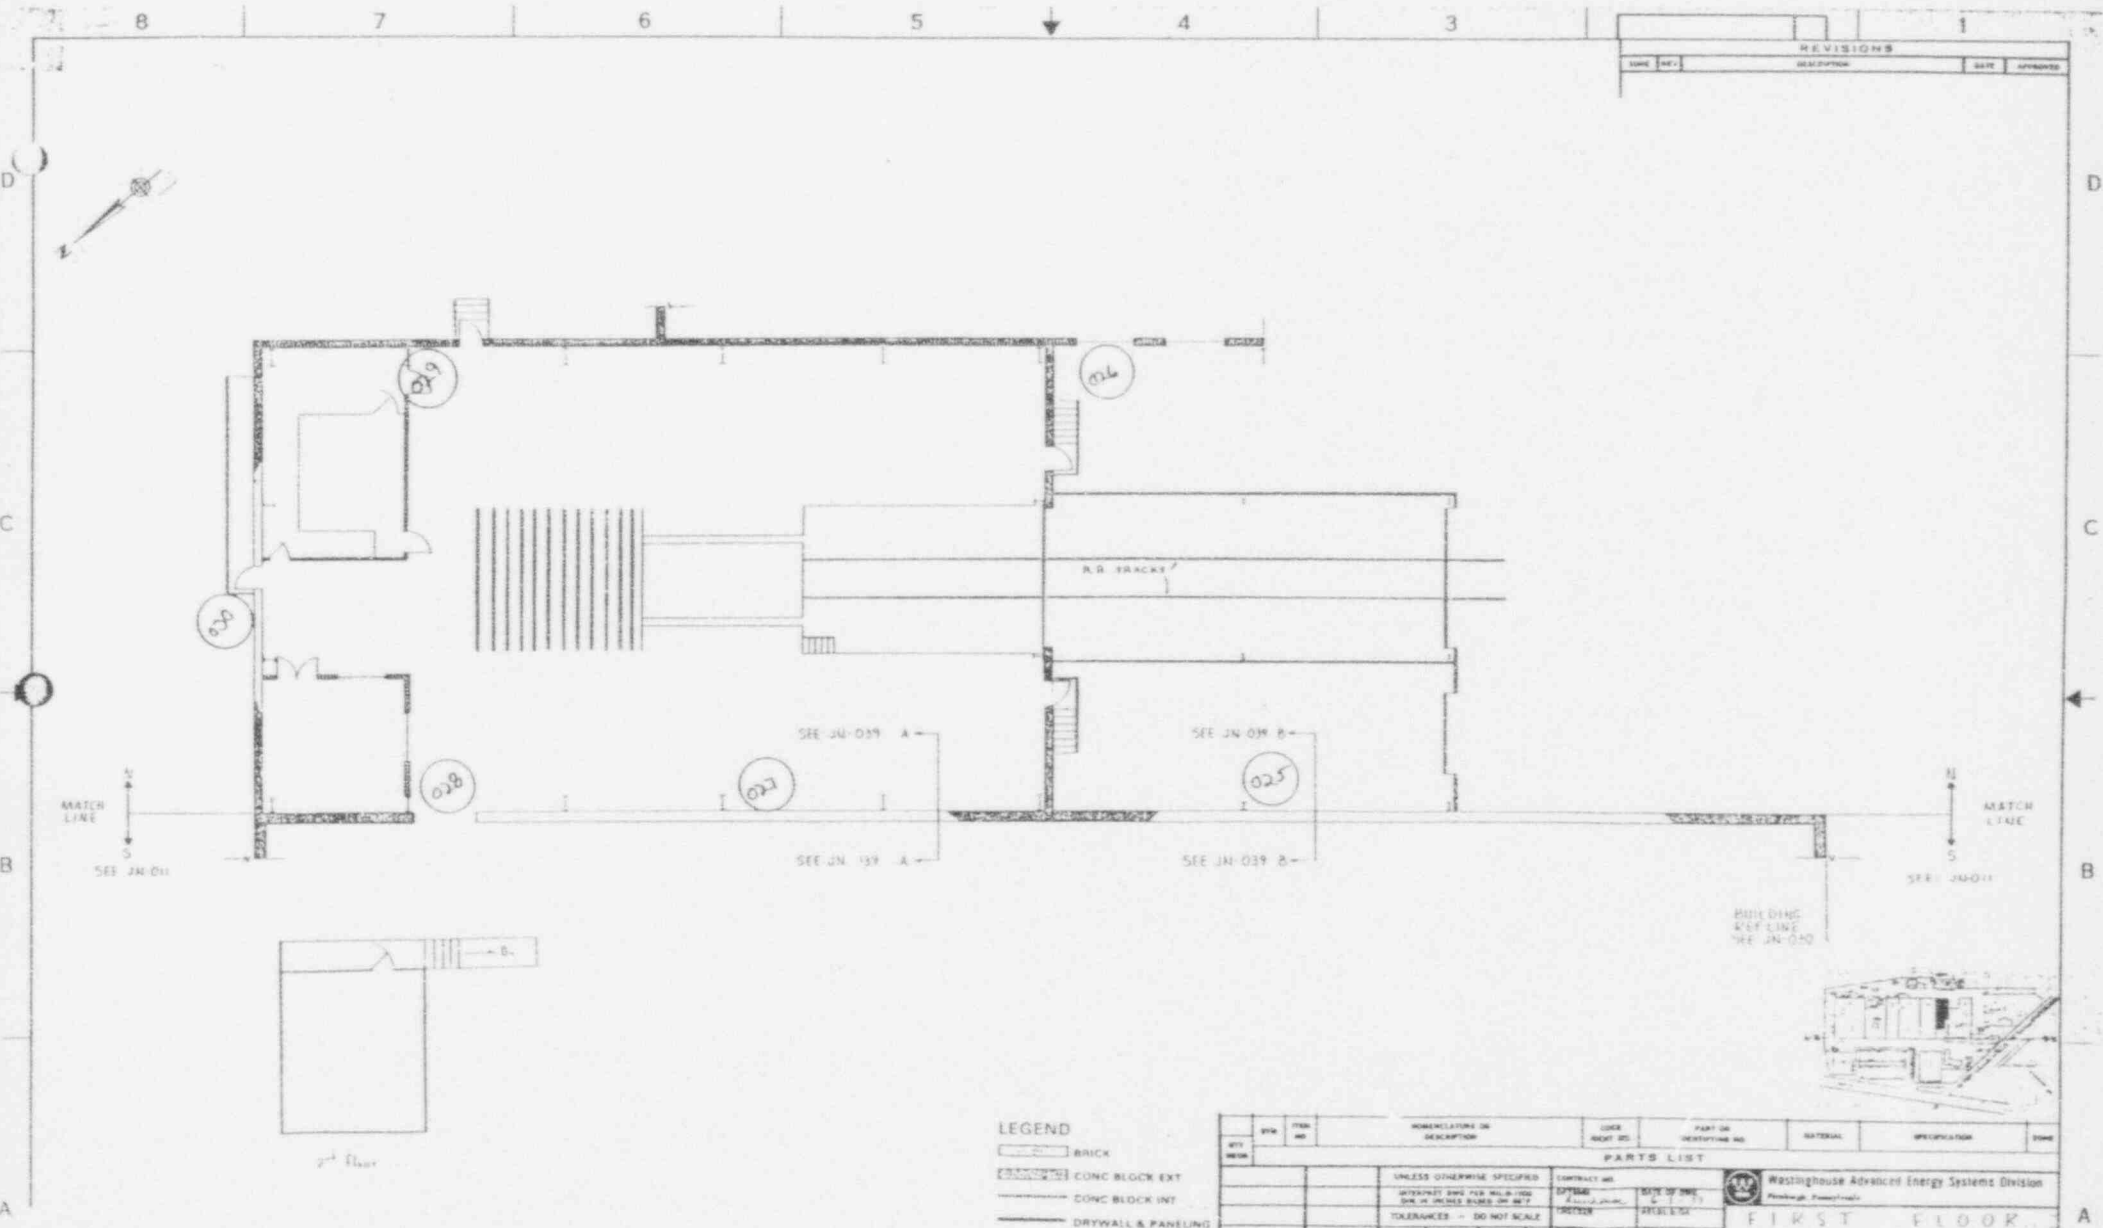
BUILDING 6A - FIRST FLOOR
